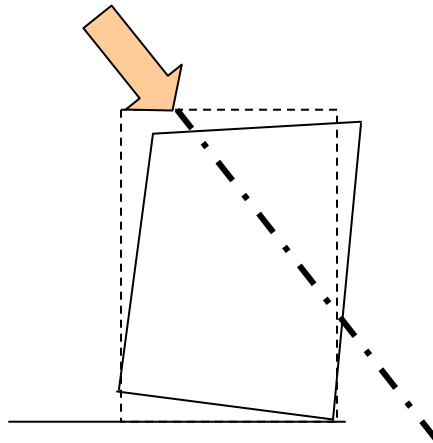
Inclined compressive force transferred in Pier 1-7 when the building was loaded in the pull direction
